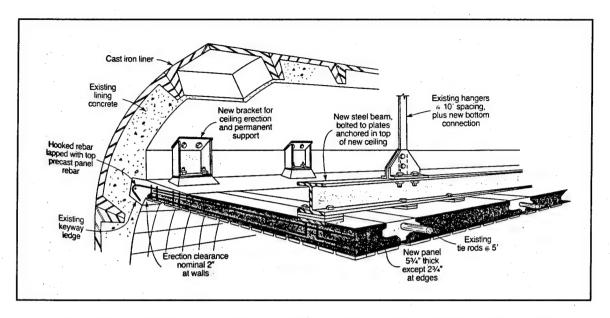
Ceiling replacement design for Holland Tunnel (from Monti and Eglot 1986)
